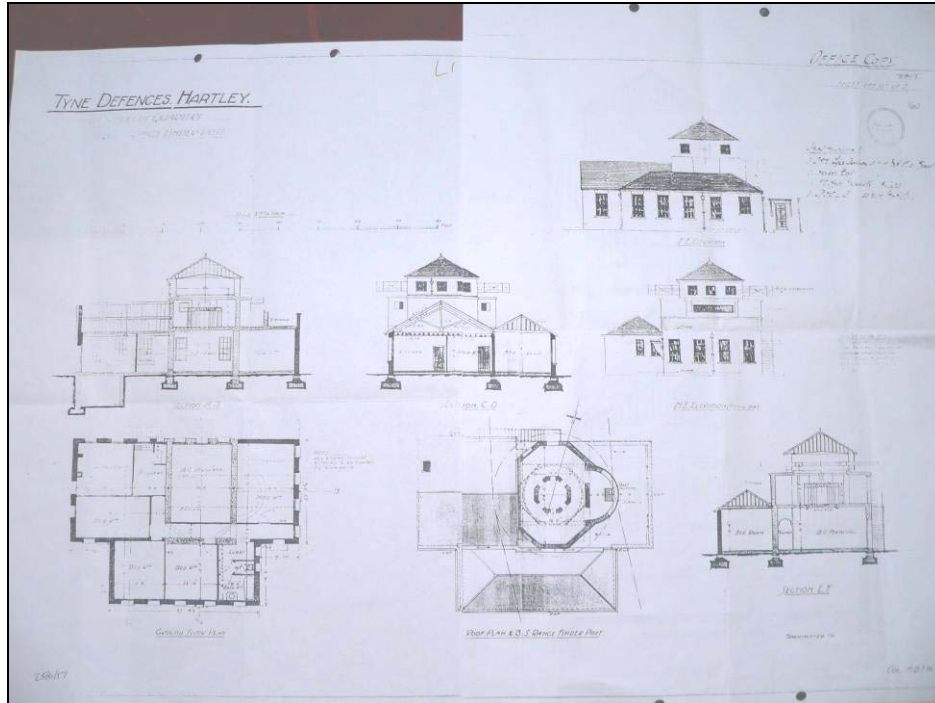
The original plans and elevations of Fort House as held by the owner.
